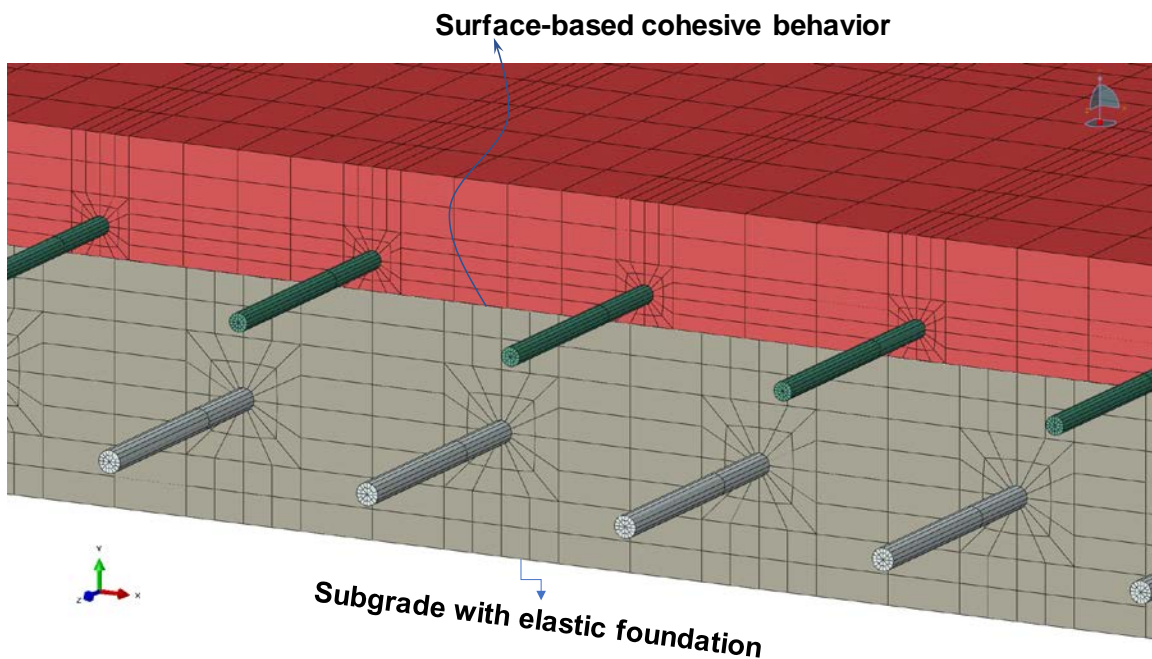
Modeling of reinforcing steel and its interface with surrounding concrete
